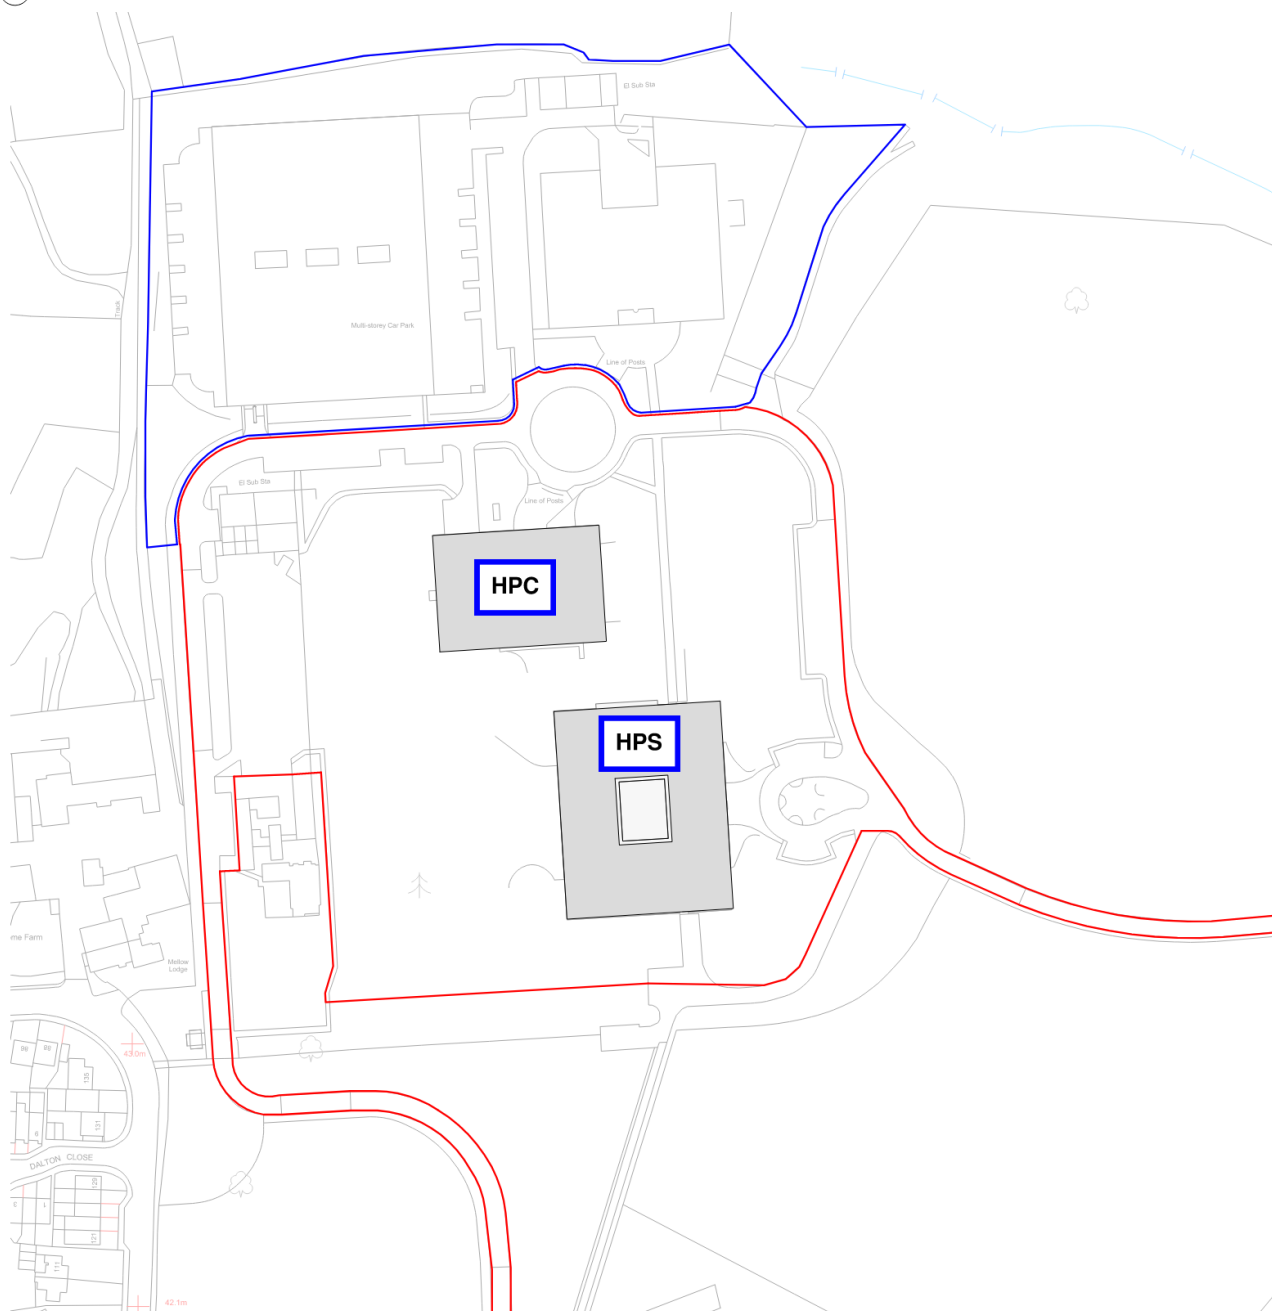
Application site plan, Hayes Park Central (HPC) is the smaller building to the north of the plan, Hayes Park South (HPS) is the larger building to the south.
